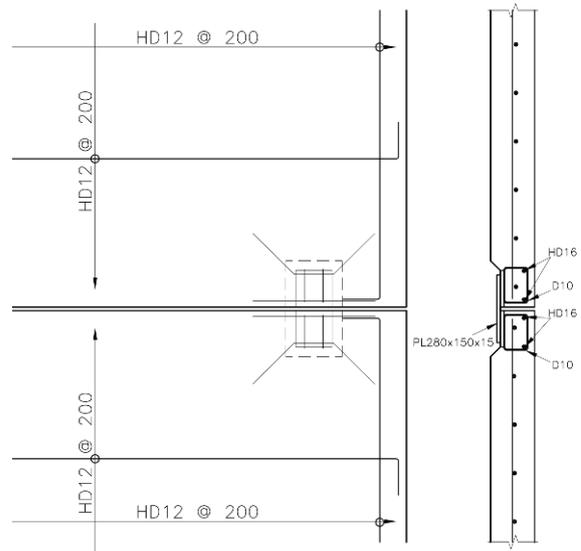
An example of a welded steel plate connection between precast concrete panels.
